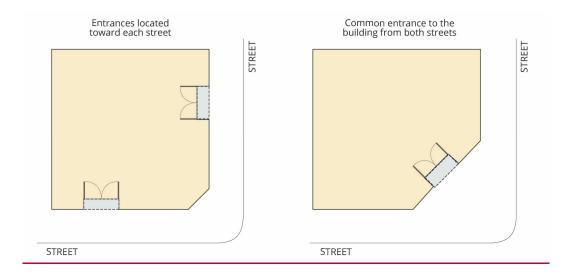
B GROUND FLOOR NONRESIDENTIAL USES, CORNER BUILDINGS ENTRANCE DESIGN
